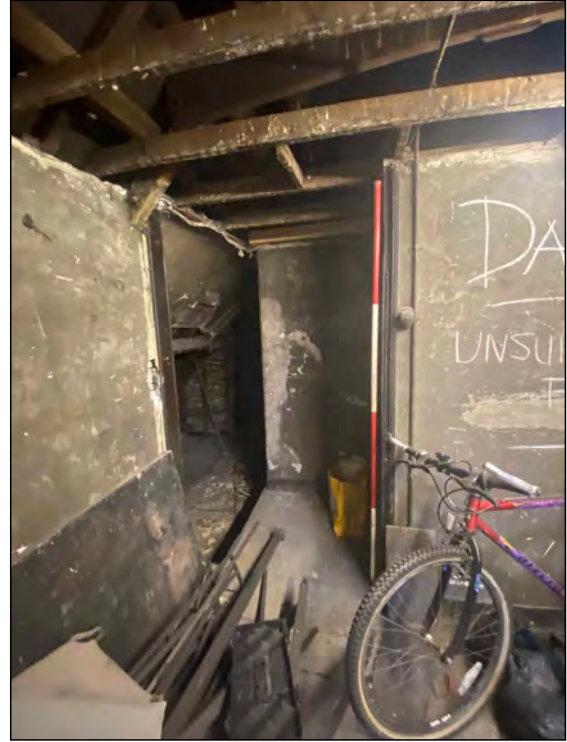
View looking NNW along the west side of the SW attic room, towards the entrance to the NW attic room.
